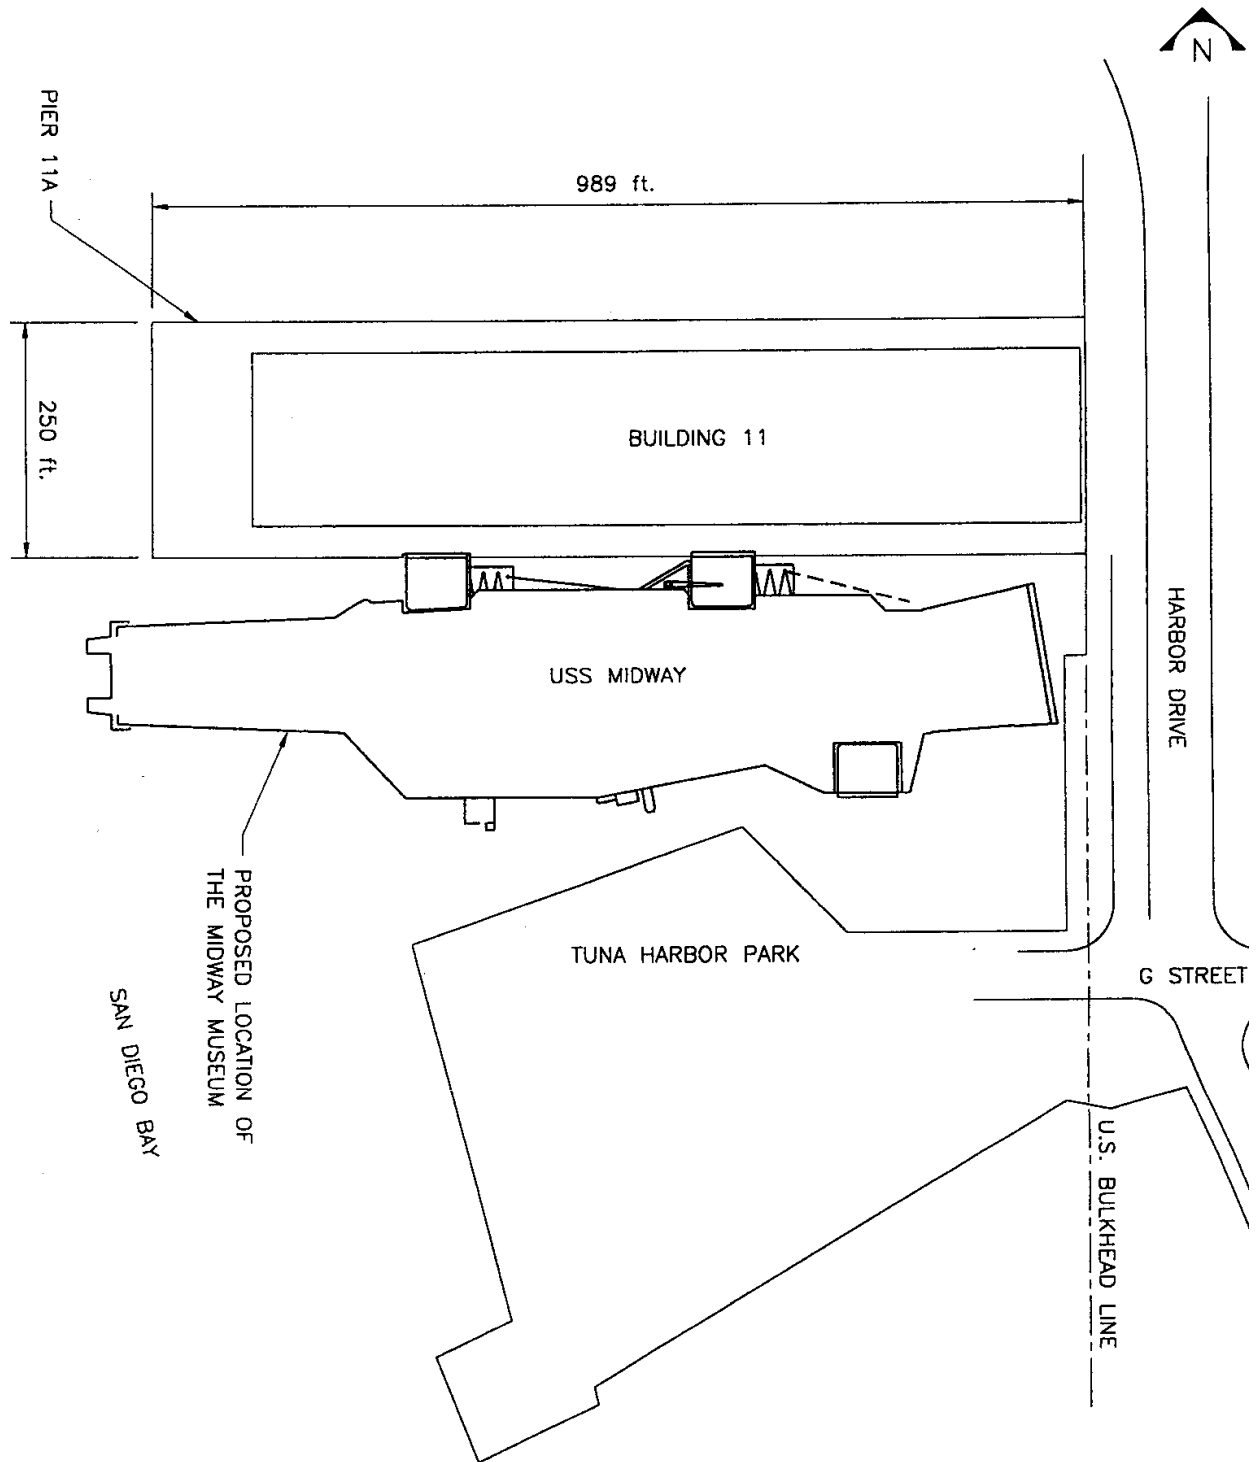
Site map showing the location of the proposed breasting platforms and the proposed mooring of the U.S.S. Midway at navy pier 11A near the intersection of Harbor Drive and G Street in San Diego, California.
